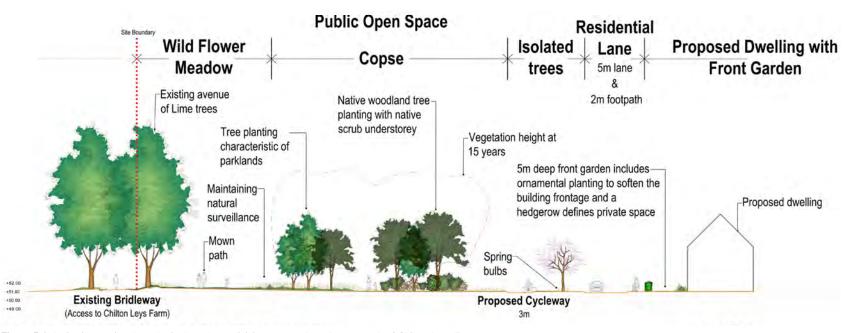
Indicative section through site boundary adjoining western boundary to south of Chilton Leys Farm
